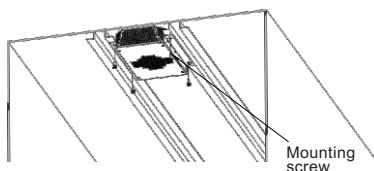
Schematic diagram of concealed mounting fixing screws
